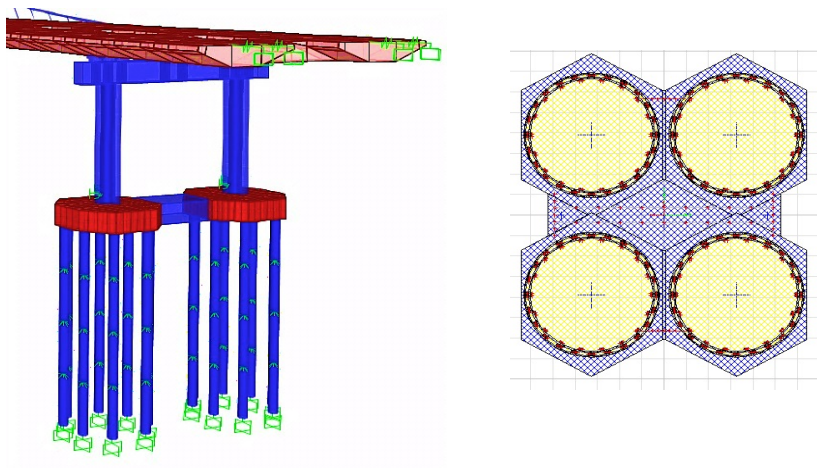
3D view of the East side and cross section of E2 pier
